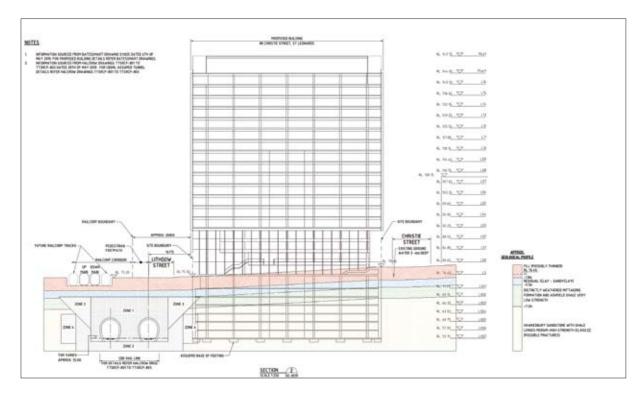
Proposed envelope near adjoining Source: Parsons Brinkerhoff
